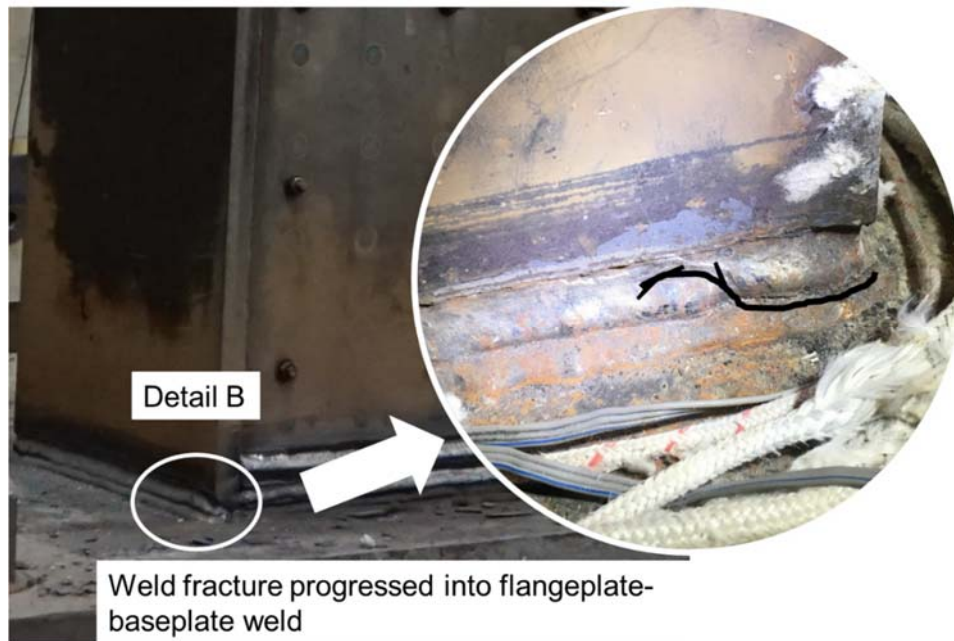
SC-W-H: Weld fracture at detail B (observed after $2\Delta_y$ heated cycles)
